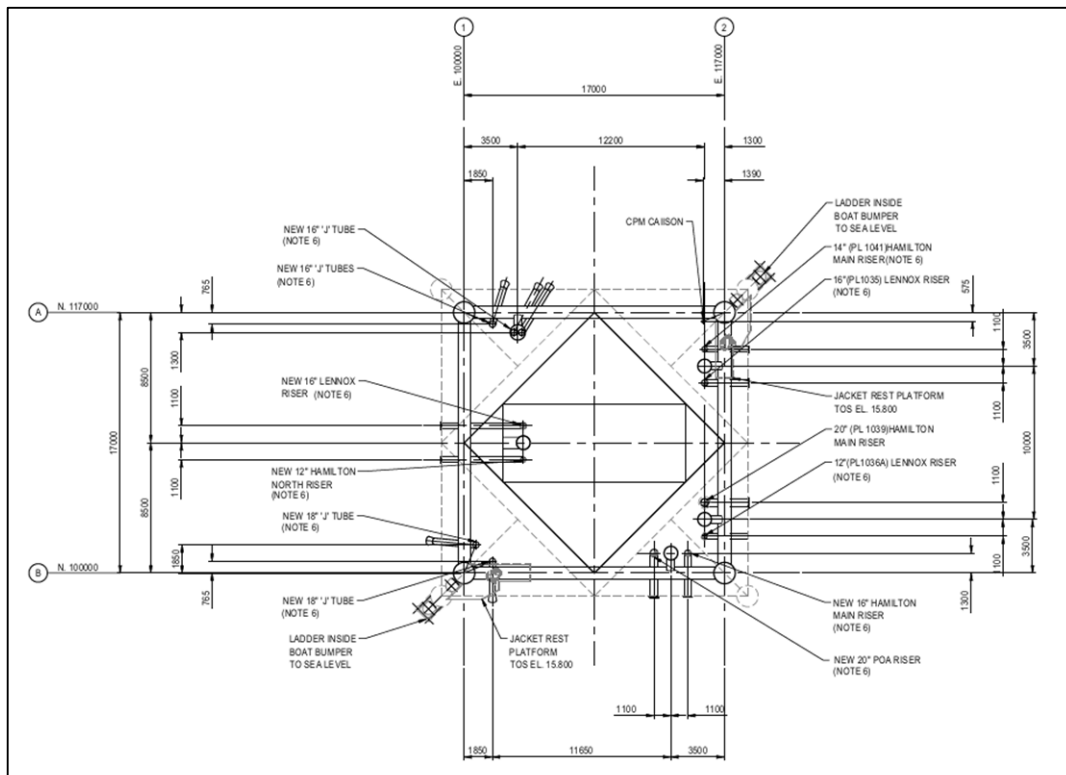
New Douglas Platform – J-Tube, Riser and Pipe Support Level +22.00 TOS prior to Installation (Offshore Installed Members)
